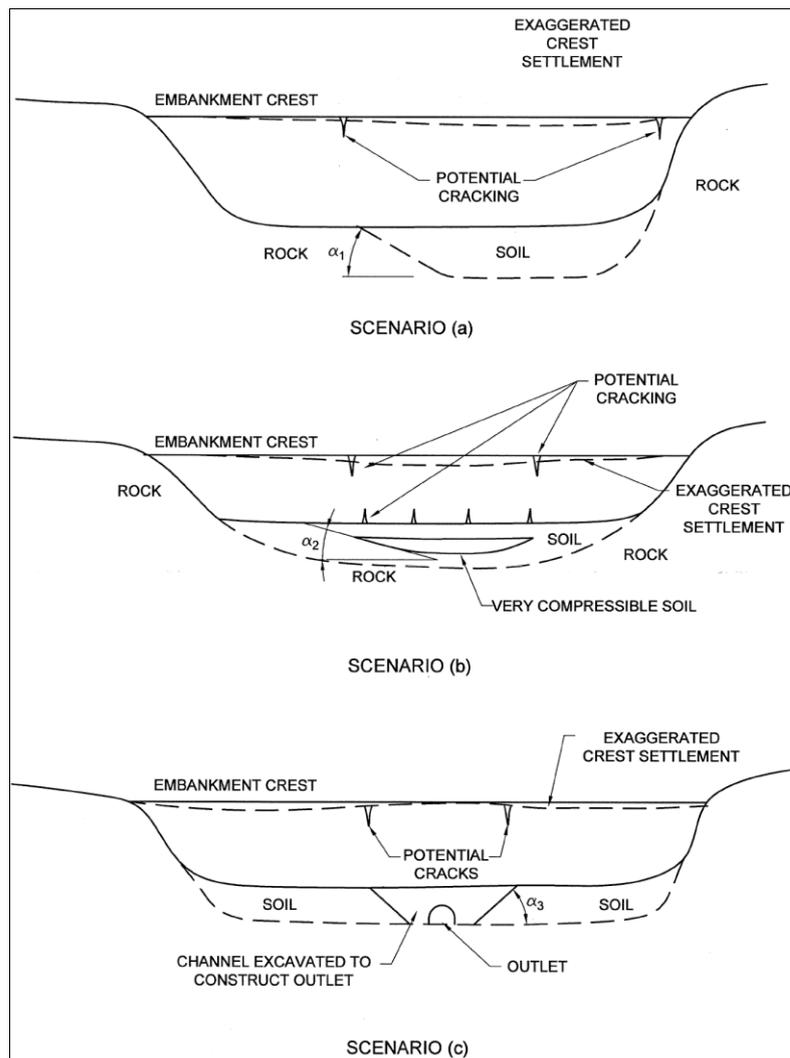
Situations which may cause differential settlement in the foundation of dams leading to cracking, lateral strains and low stress zones subject to hydraulic fracture (Fell et al 2008, based on Sherard et al, 1963)
